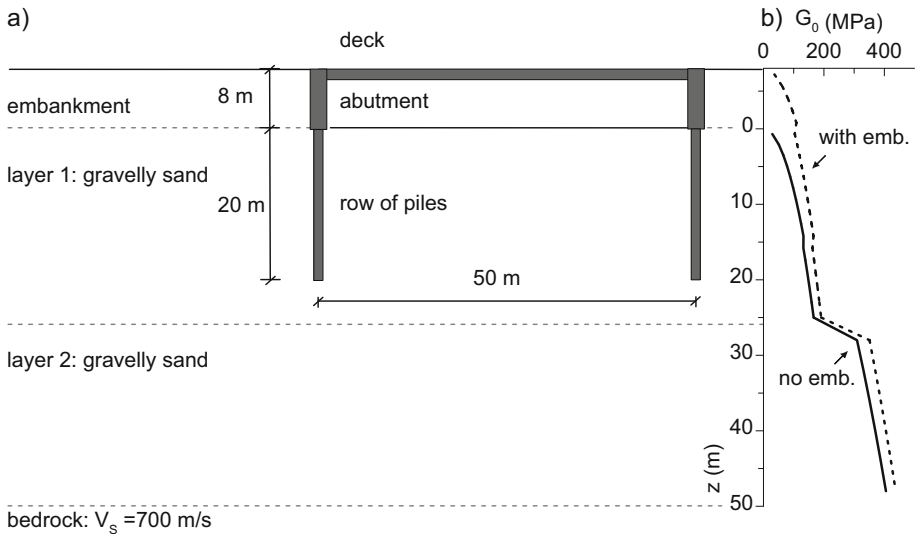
(a) Schematic longitudinal section of the case study; (b) profile of the small strain shear modulus G_0 with depth.
